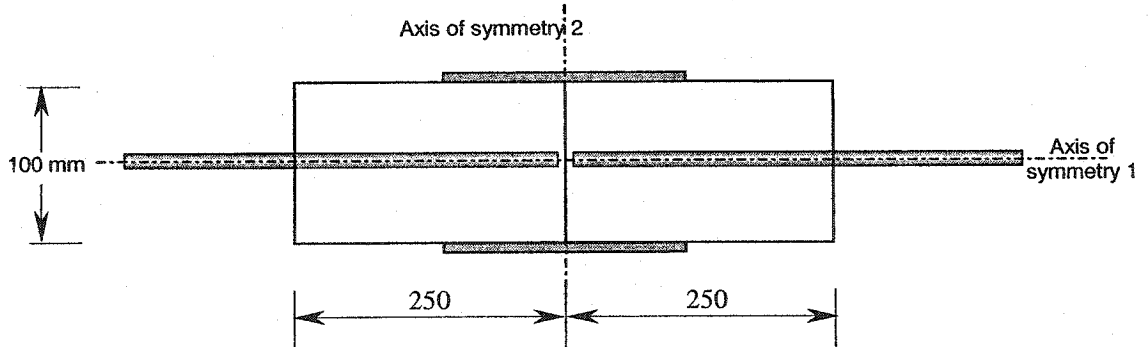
Pull-apart specimen elevation and symmetry lines
